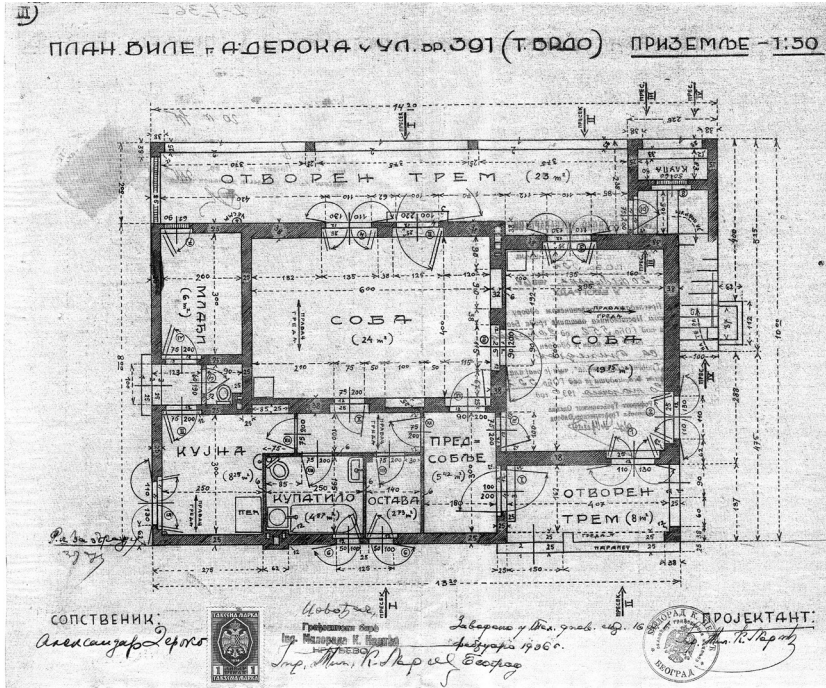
Floorplan for the Deroko house (IAB f. 2-7-1936)
